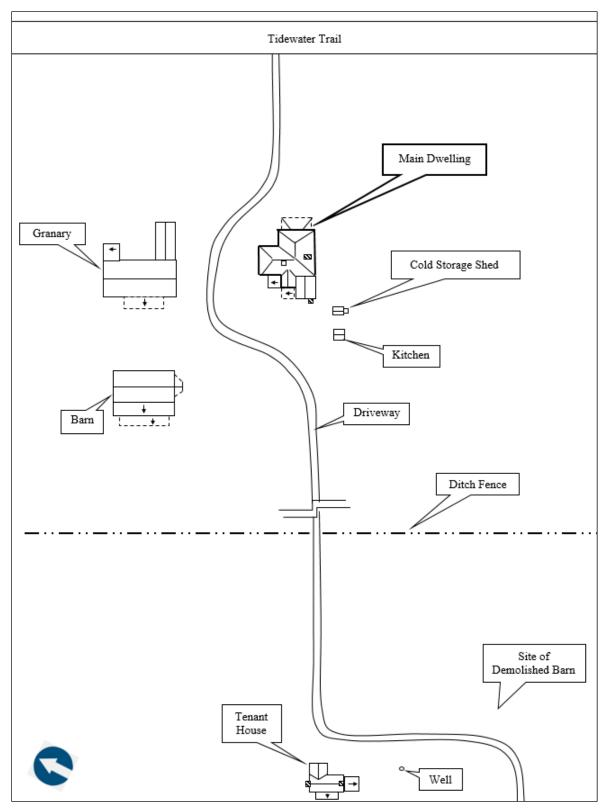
SITE PLAN FOR SLAUGHTER PEN FARM (088-0254) (NOT TO SCALE)
